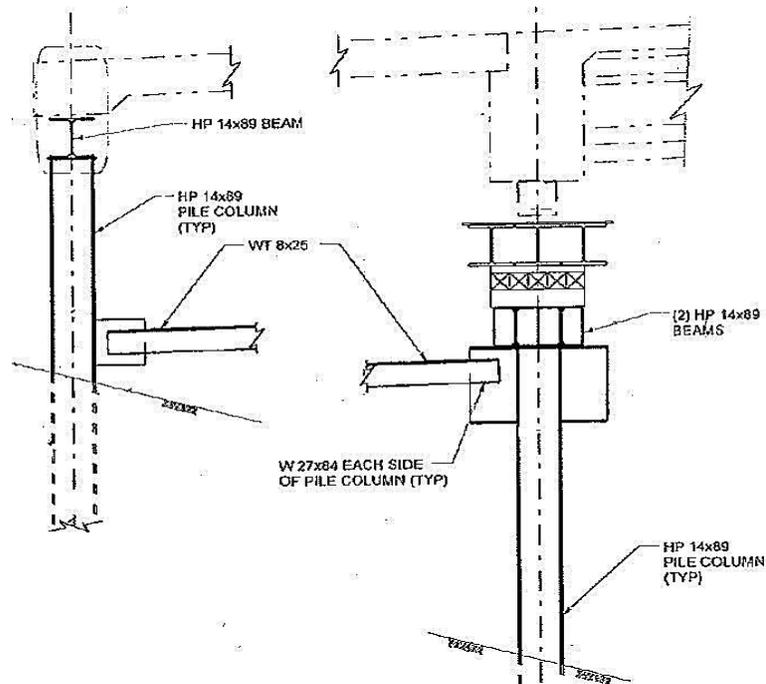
End view of the I-80 over 2300 East, WB bridge temporary substructure at the abutment and the end of approach with lateral bracing
